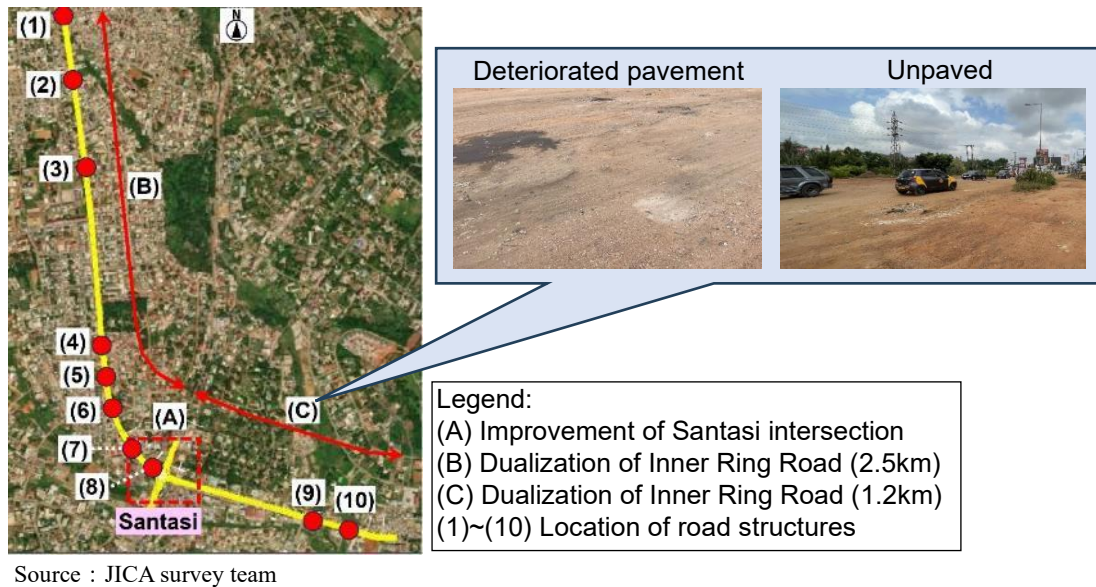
Locations of Road Structures in Combination Scheme-2
